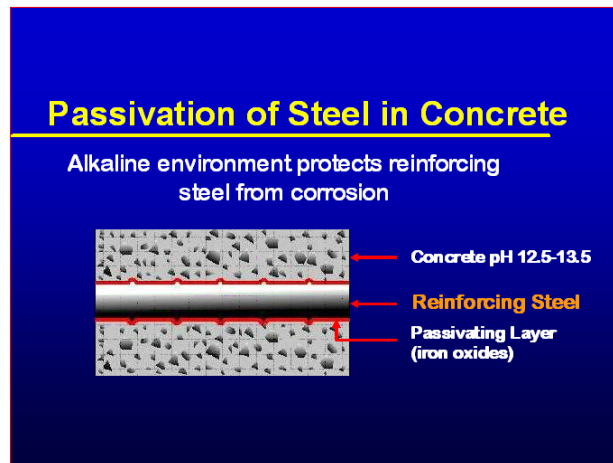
Diagram of passivation of steel in concrete under normal conditions [91].
